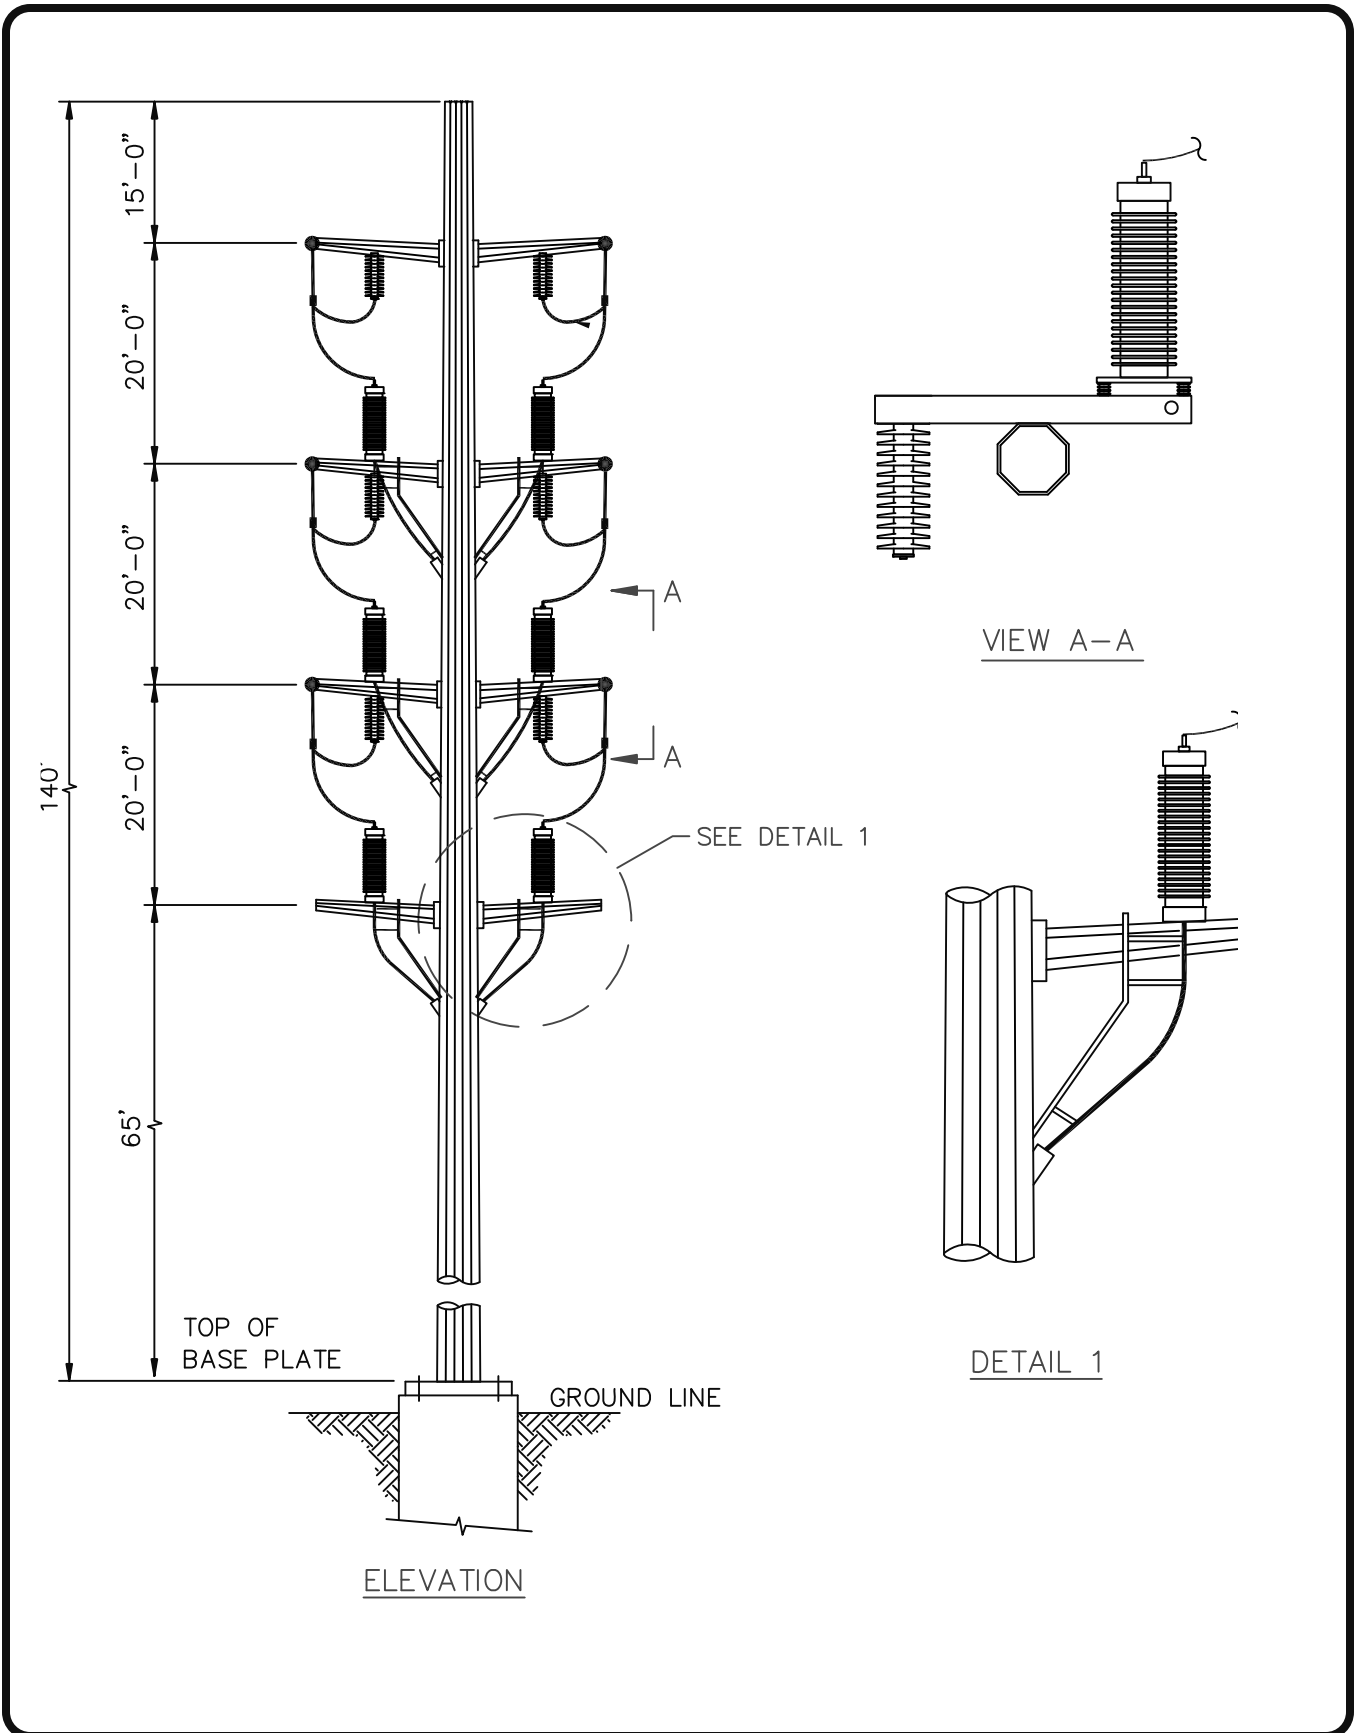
Proposed 12 kV Steel Riser Pole Typical Drawing
